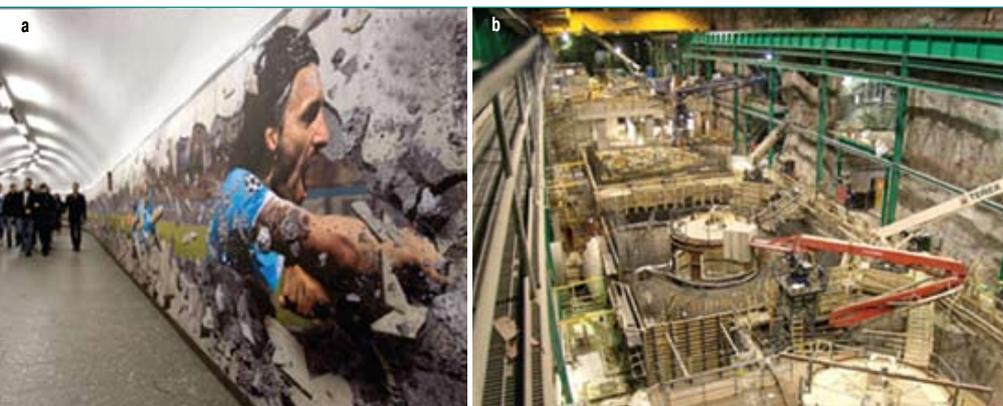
Hybrid underground structures: a – underground pedestrian crossings, b – hydroelectric power plants
